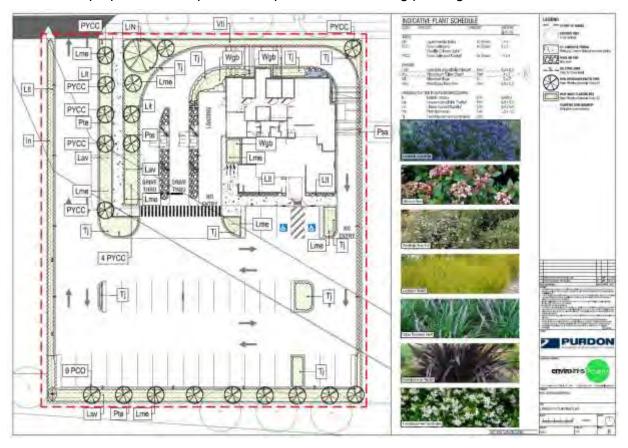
Landscape Plan 1 (Source: Enviro Links Design)
